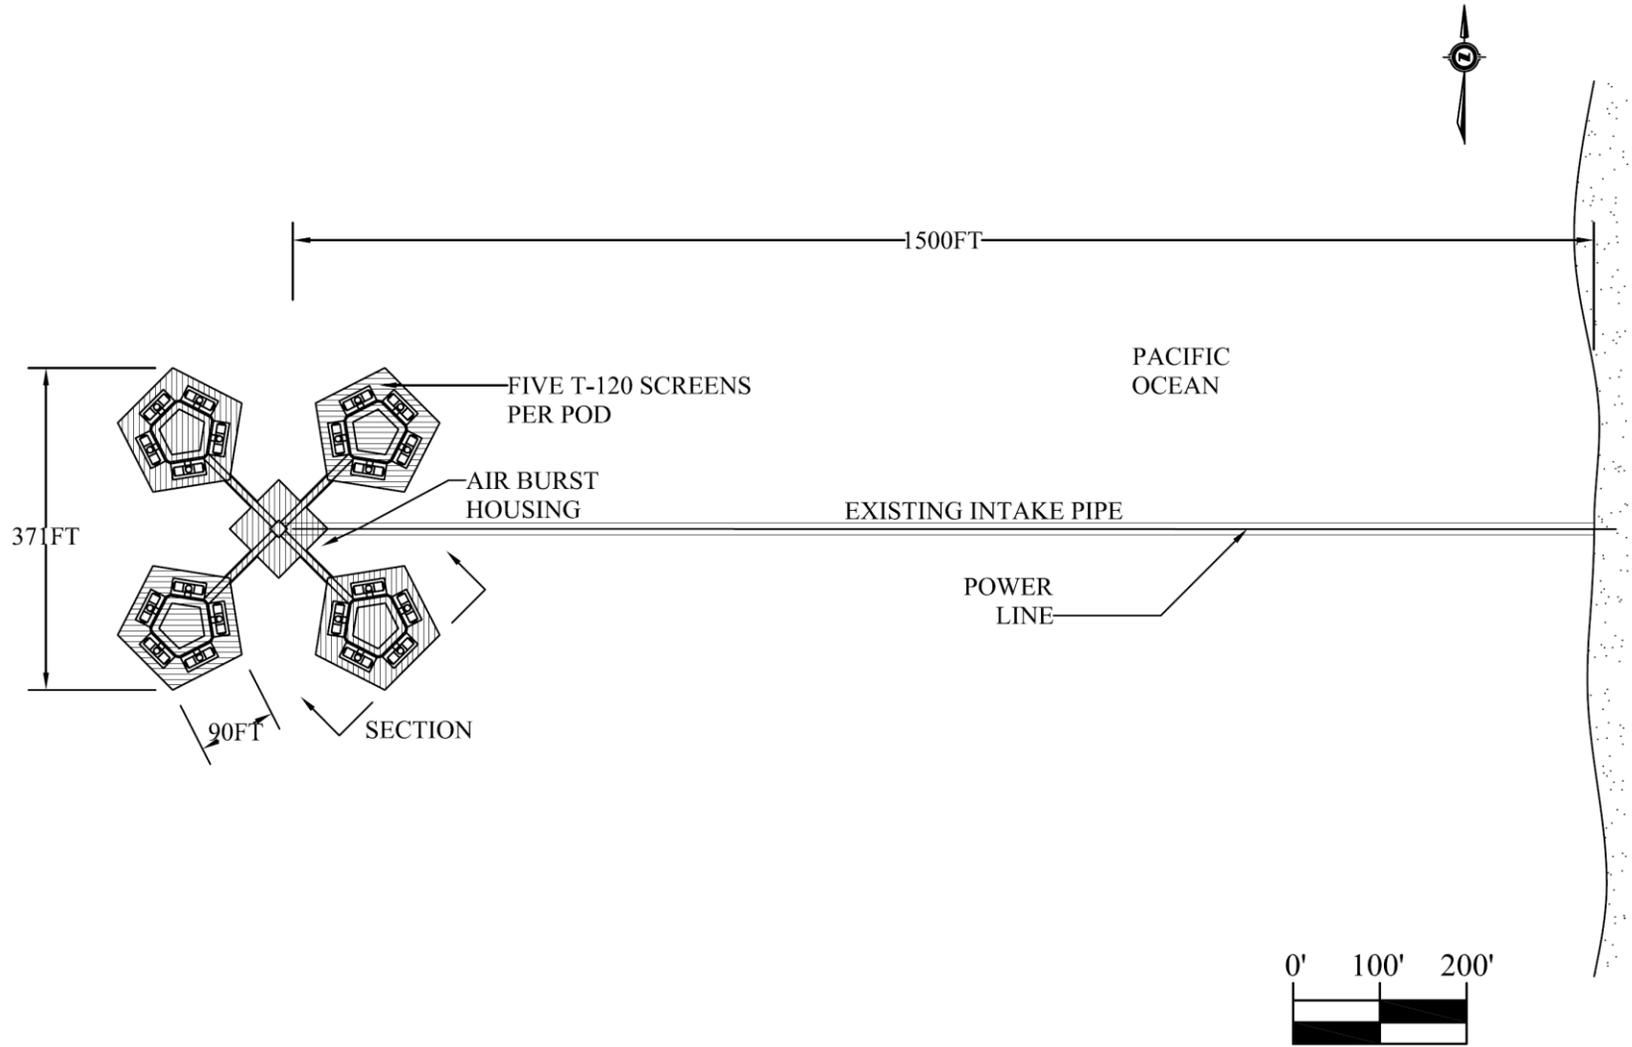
Wedgewire Layout 2 "Pods" - Section
